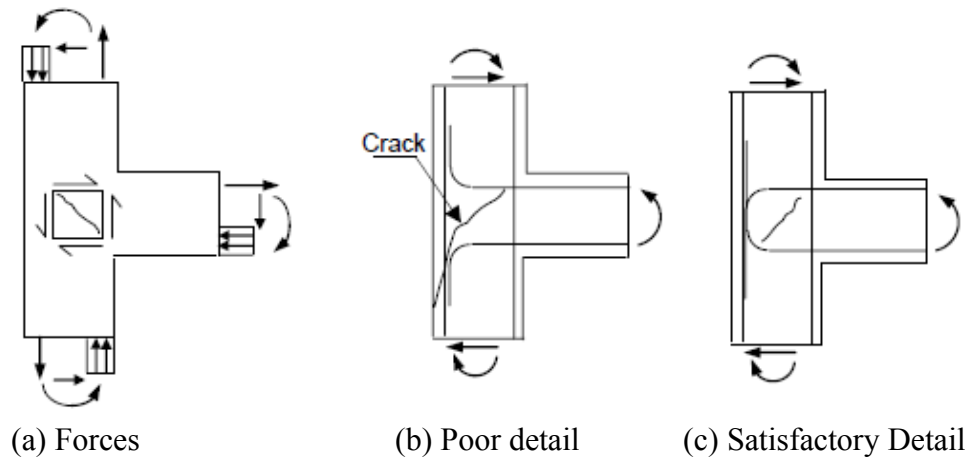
Forces acting on Exterior Joint (Uma and Prasad 2005)
